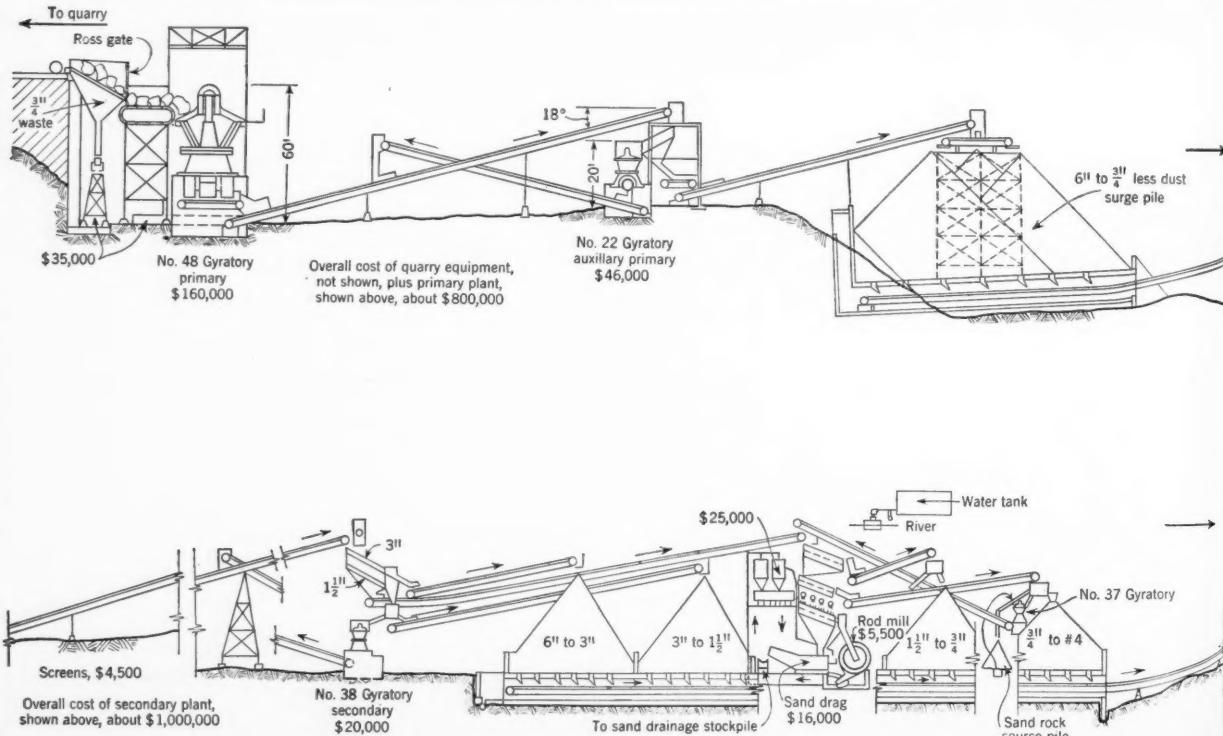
MACHINES FOR ASPHALT AND CONCRETE PAVEMENTS
